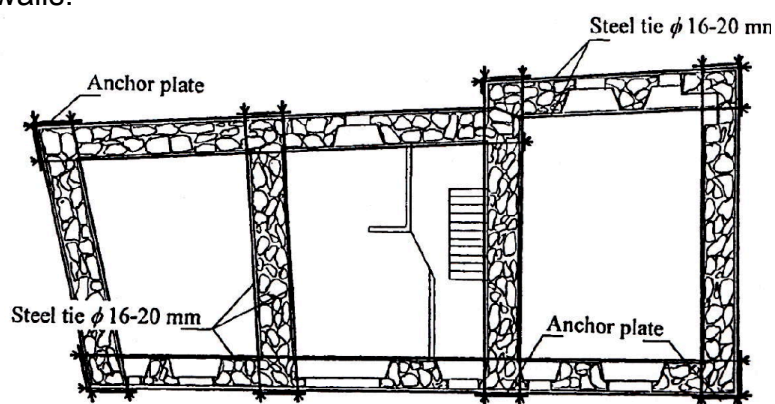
Position of steel ties in plan of a rural stone-masonry house [21]
